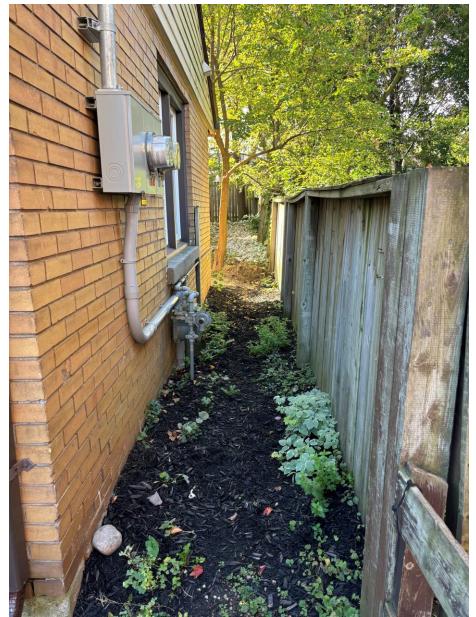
Existing side yard setback and unobstructed walkway to additional dwelling unit (detached).
